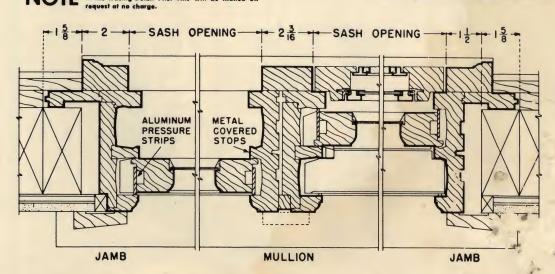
Brick Veneer construction with windbreaks set flush with sheathing.
